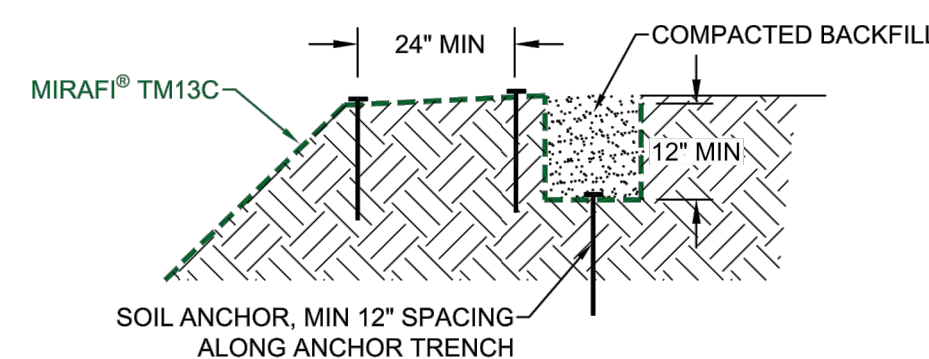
TYPICAL INTERMITTENT TRENCH
